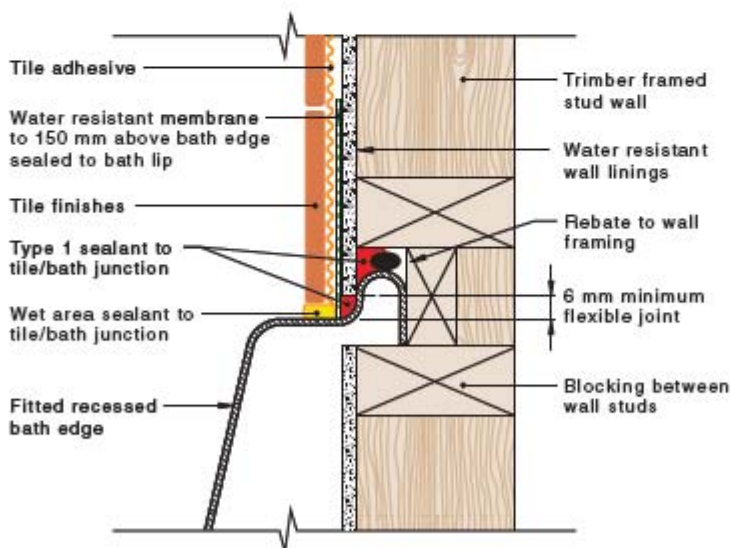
(D) — Bath with no shower over it — Fitted bath — Timber-framed wall
